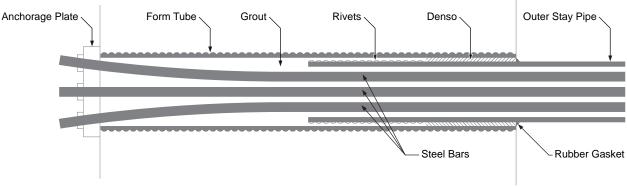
EXISTING CABLE ANCHORAGE: (I) EXISTING ANCHORAGE DETAIL
